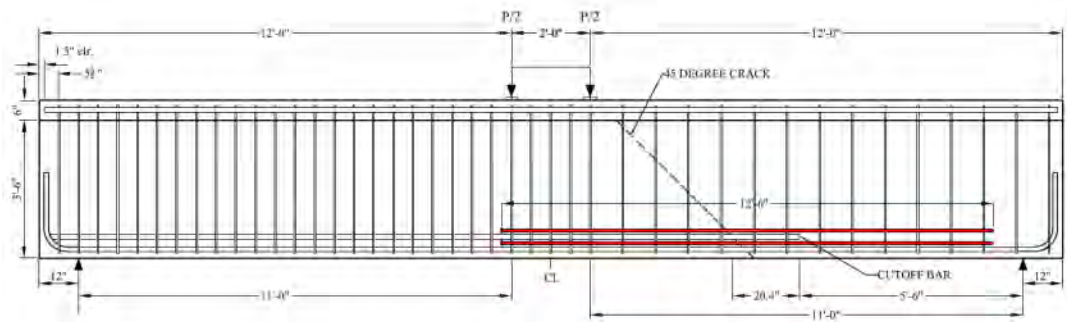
Elevation of specimen T.45.Ld3(10).Ti.
